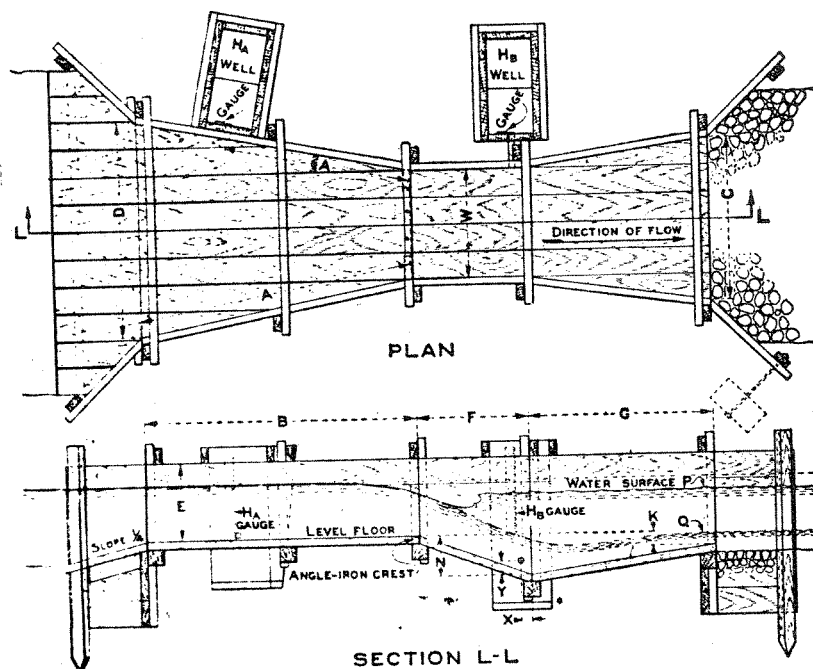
Plan and elevation of the Parshall measuring flume
